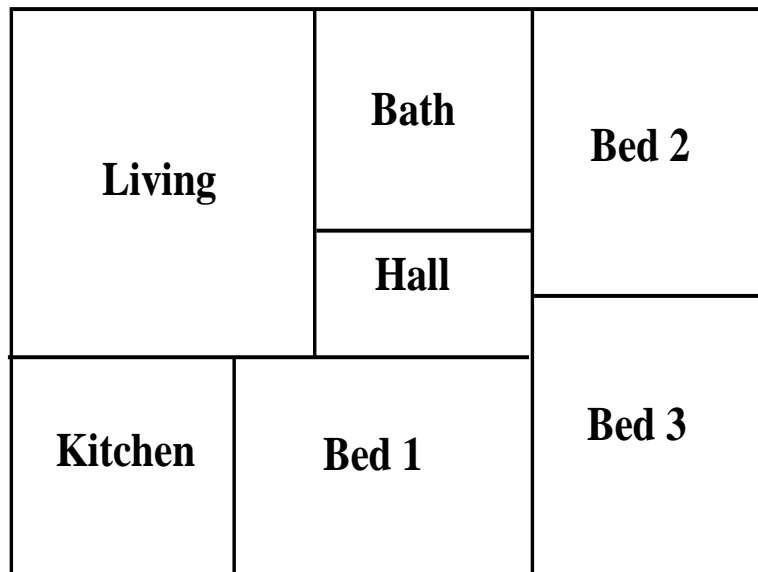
Dimensionless floor plan of a three bedroom apartment
